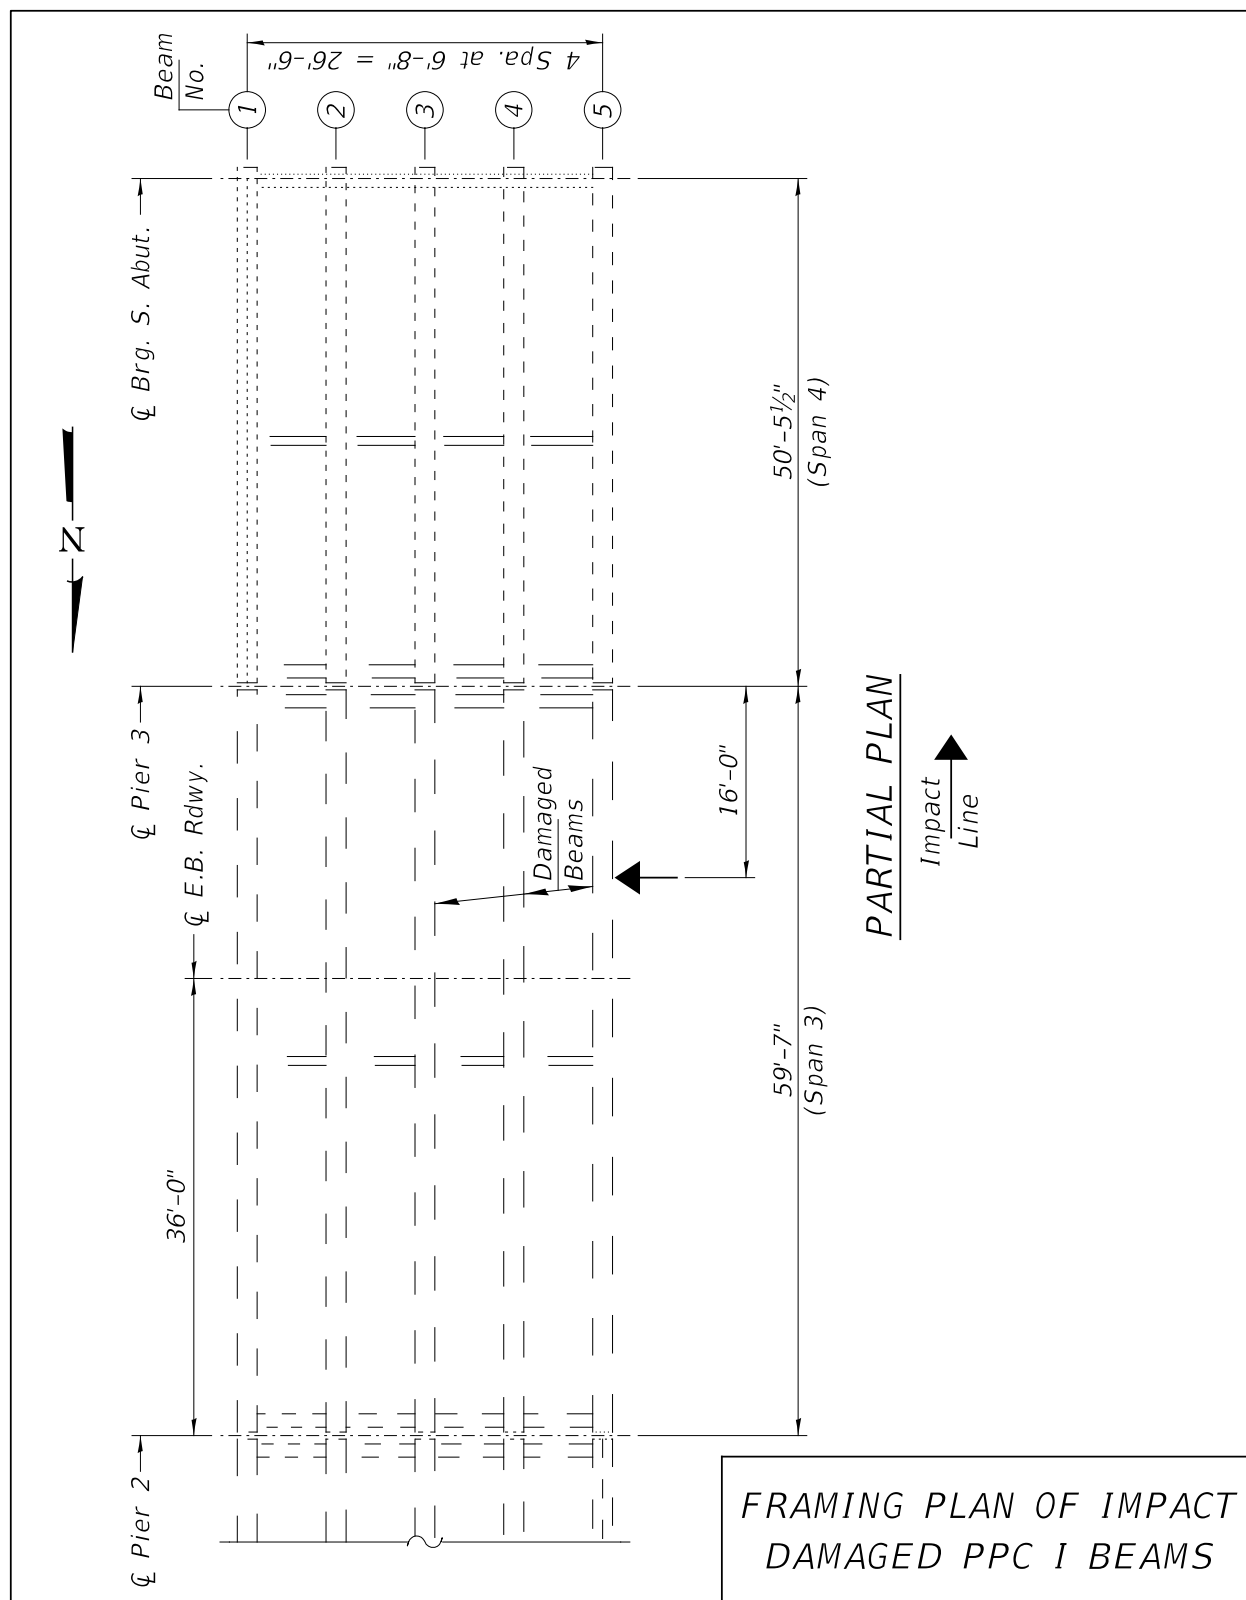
Framing Plan of Impact-Damaged PPC I-Beams
